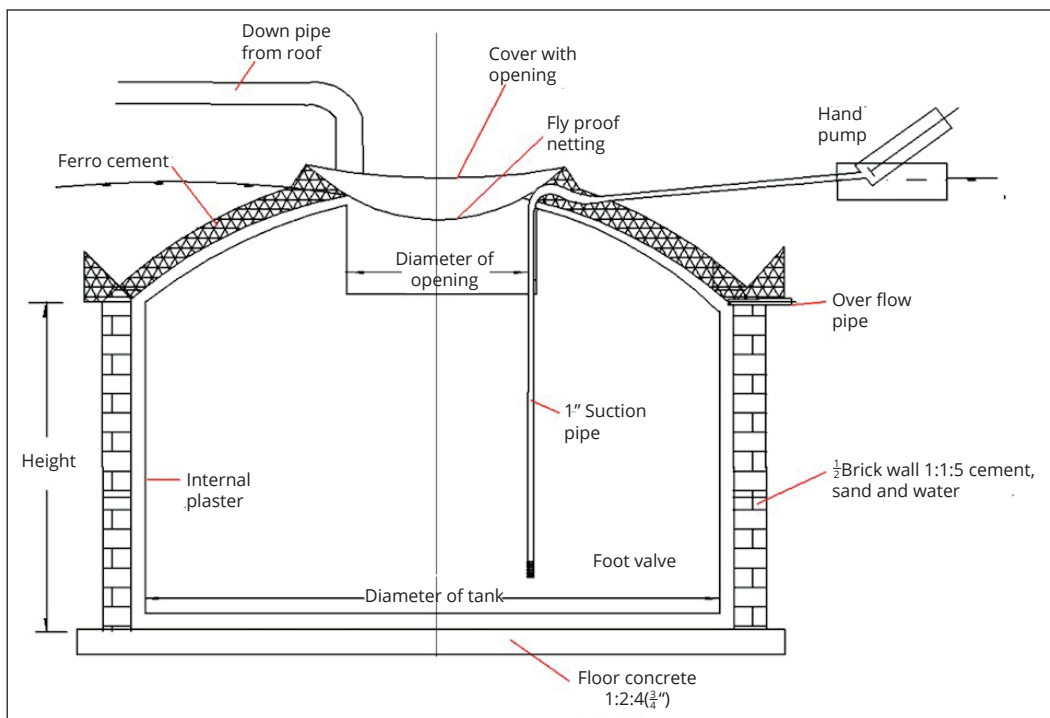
Underground Dome Shaped Ferro-cement Tank
